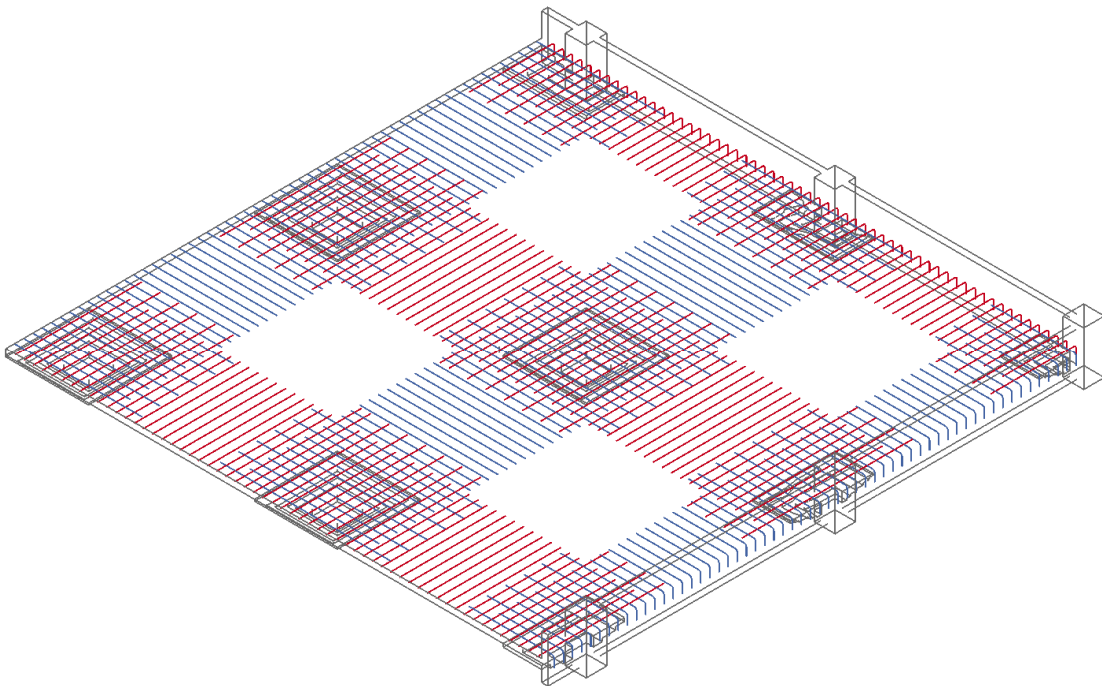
Isometric view of the slab top rebar top mat in two directions. Note: an outline of the concrete model is shown in grey. Elastic columns are not shown.
